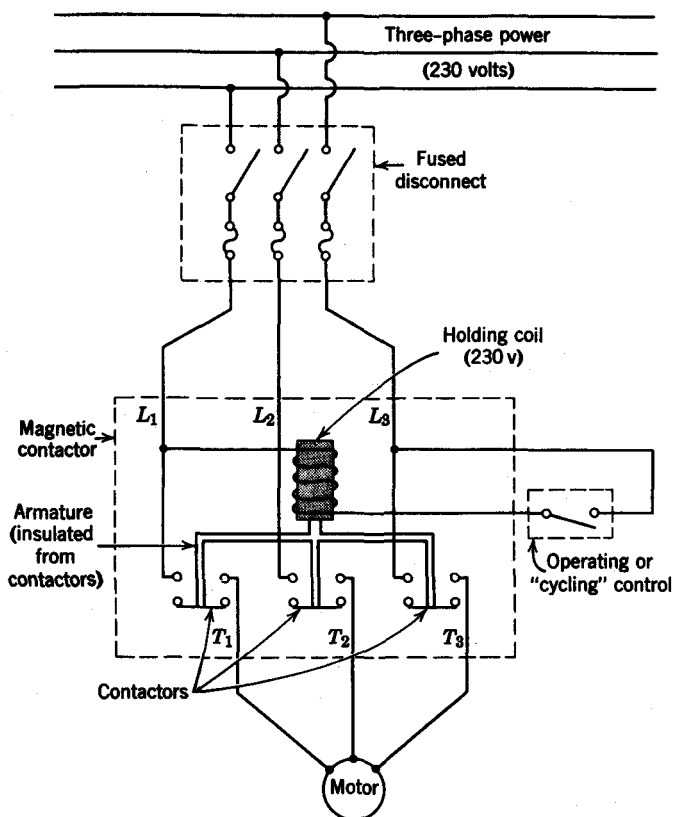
Motor controlled indirectly through magnetic contactor.
